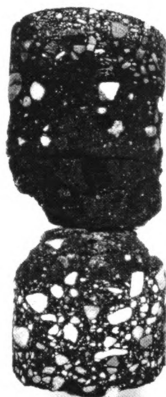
Asphalt core 1 of section 29, site 5 (used for bad samples) at 3.7X.
